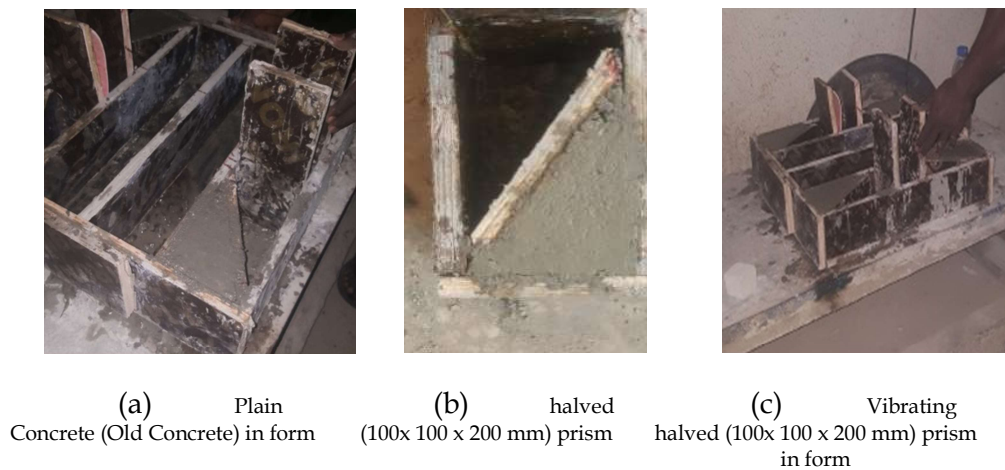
Plain Concrete specimen casting in progress (Old Concrete)
